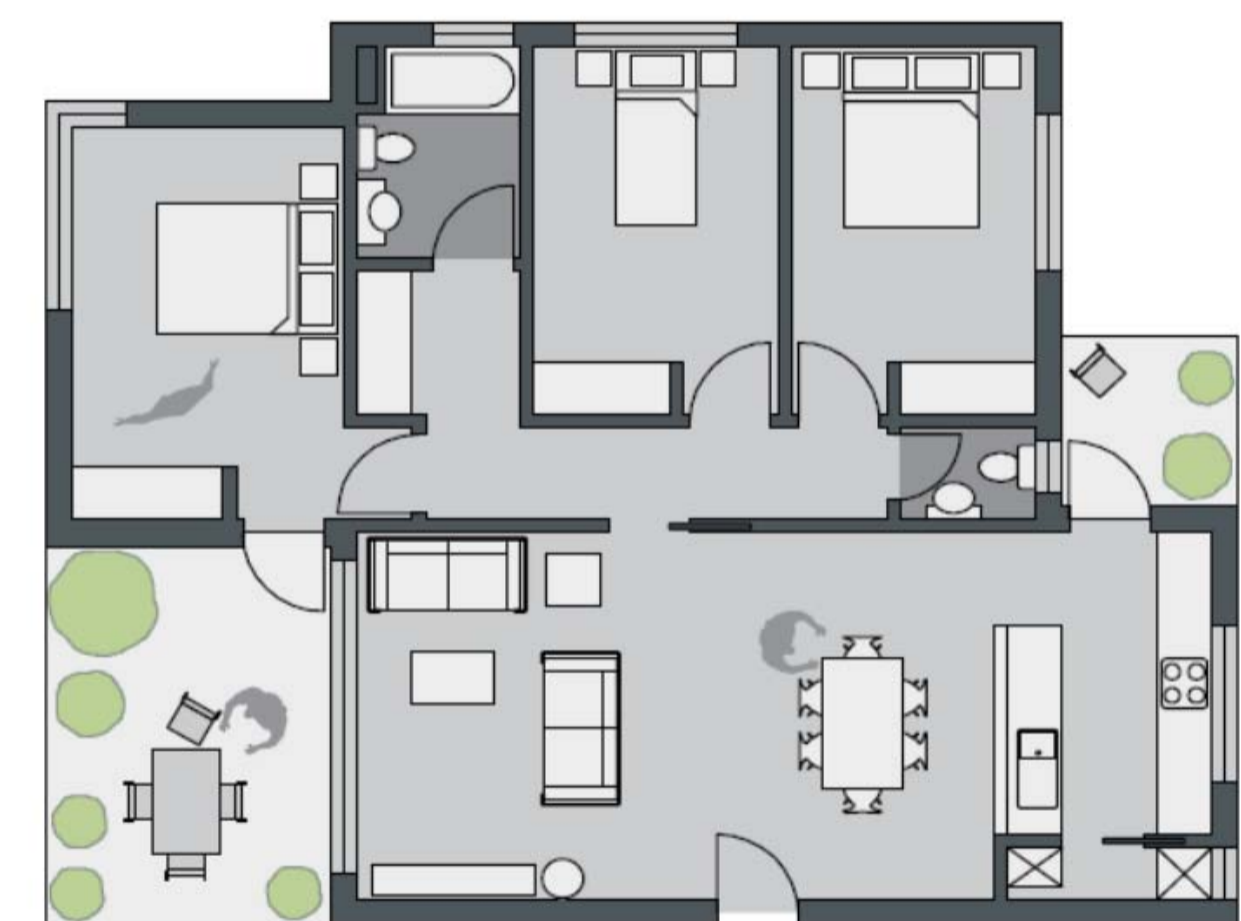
E.4 Building layout should maximise balcony use by allowing access from the main living area and a bedroom (where possible). Secondary balconies provide further amenity to apartment living and are best accessed off kitchens and laundries
